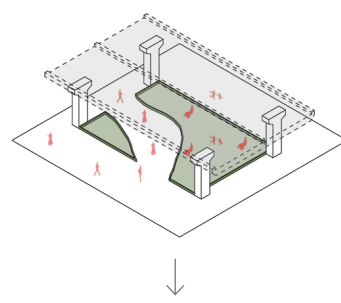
Retail shops underneath the railway platform in Rotterdam Central Station ("Rotterdam Central Station / West 8 + Benthem Crouwel Architects + MVSA Architects", 2021)
